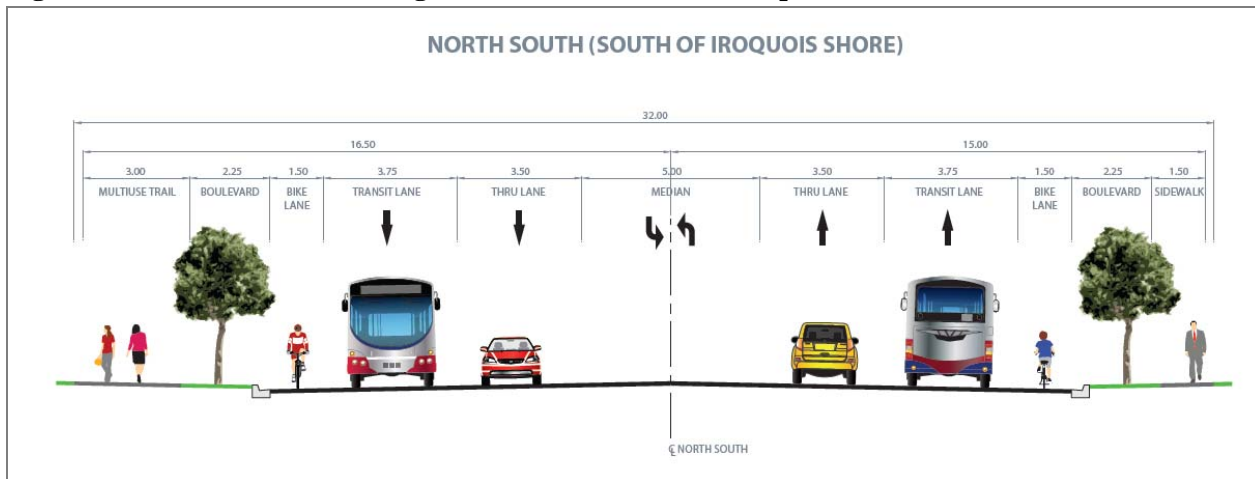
North-South Crossing Cross-section (South of Iroquois Shore Road)
